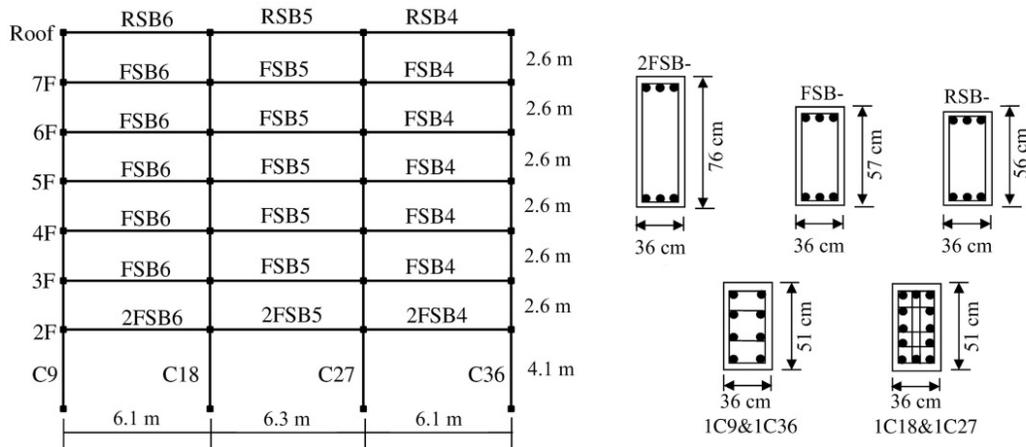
The building frame and cross sections of the beams and columns (adapted from [13])
